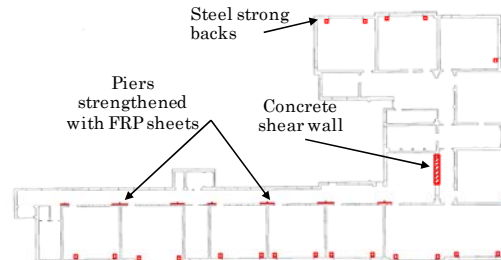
Floor plan of Shirley Community centre showing retrofit
